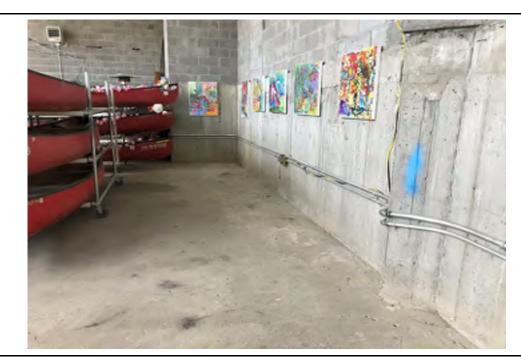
Concrete slab in subgrade boat house located within the southern portion of the building, facing northwest. 30 March 2021.
